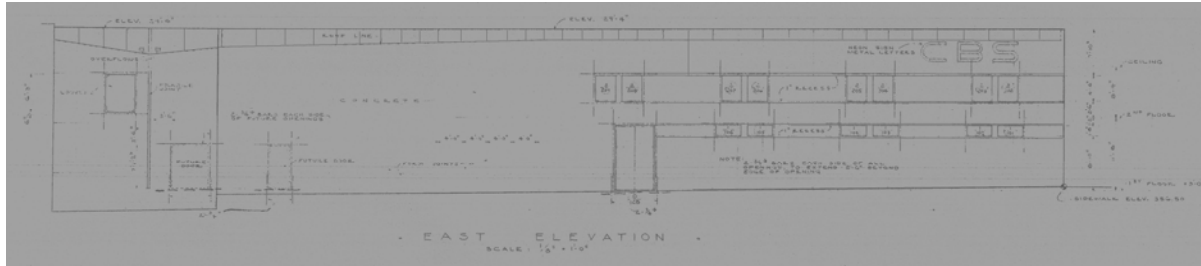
Parkinson & Parkinson drawing of east elevation of Studio B/C
